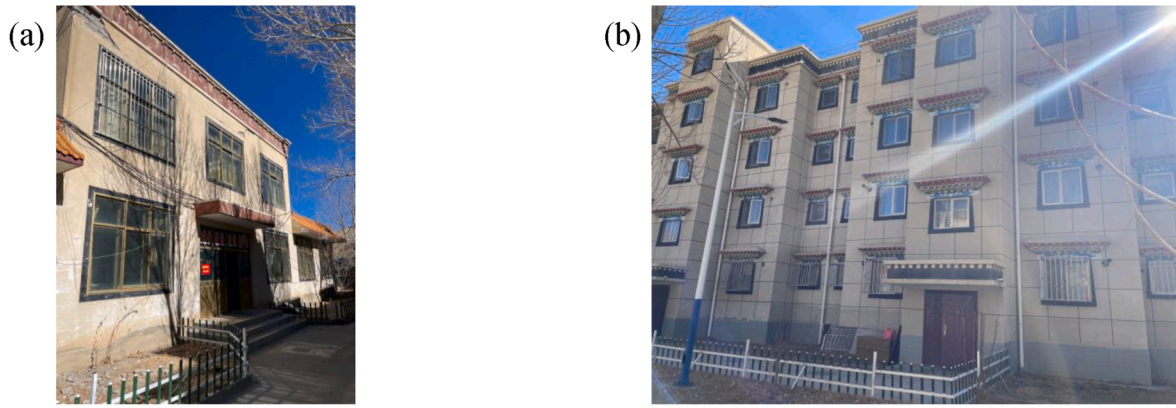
Structural damages of public buildings in Quluo Town, (a) town government office building (two-story masonry structure), and (b) town government dormitory building (five-story masonry structure).
